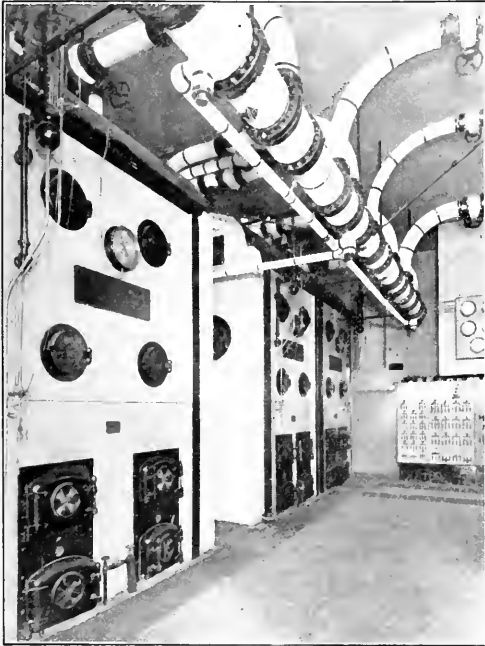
THREE 196-HP. WATER-TUBE BOILERS: FUEL OIL IS USED IN THE FURNACES
